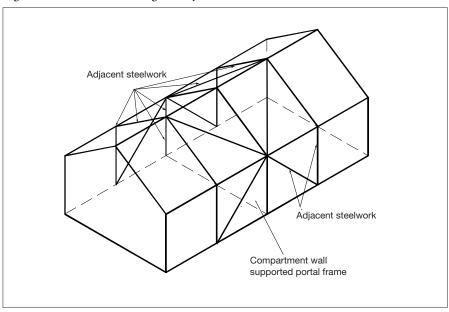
Compartment wall supported by portal frame and adjacent steelwork
